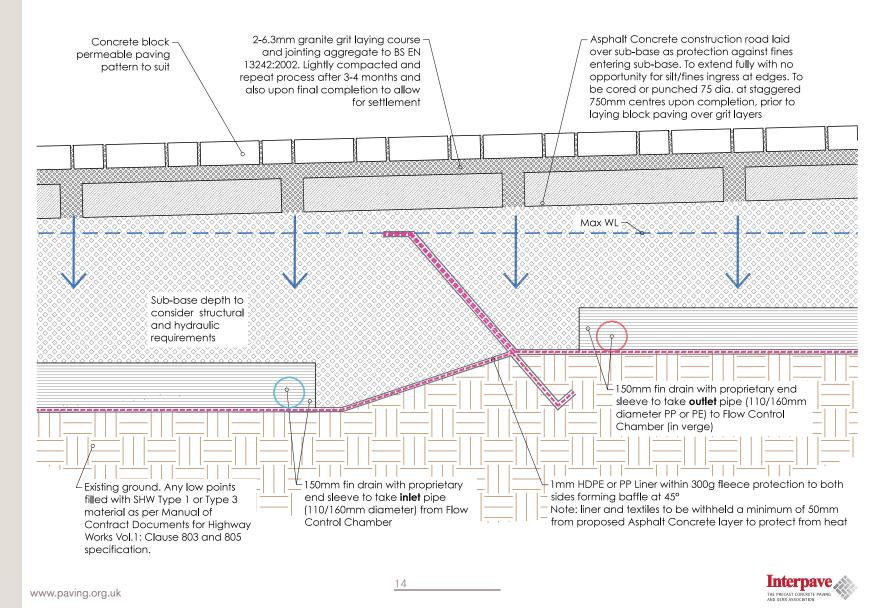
Permeable Paving (with no Contributing Surface) Adjacent to Building
